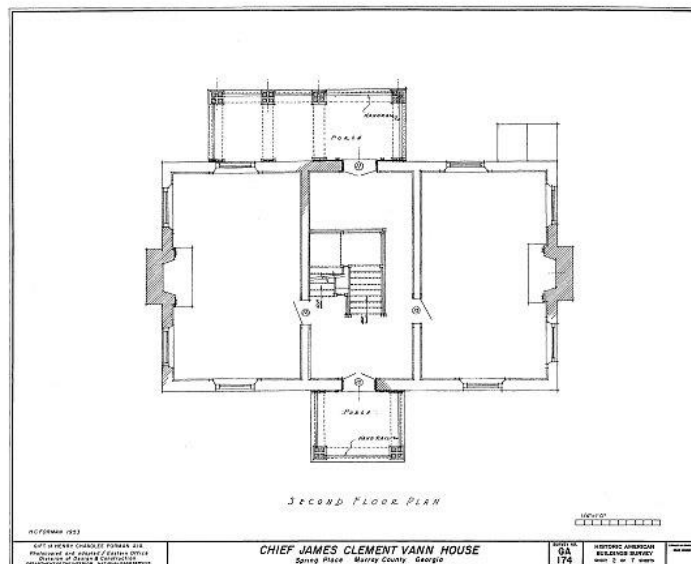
Chief Vann House second floor architectural floor plan illustrating a small balcony on the north elevation, a central hallway and stairwell with the master bedroom on the west side and guest bedroom on the east side. (HABS).
